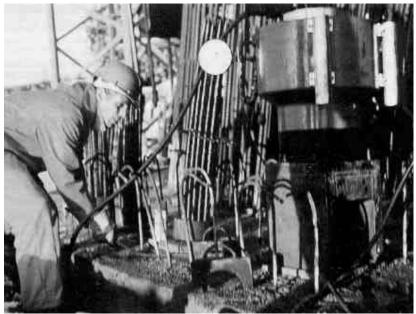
VSL Anchors to secure the 'Leaning tower of Stavanger' being stressed
